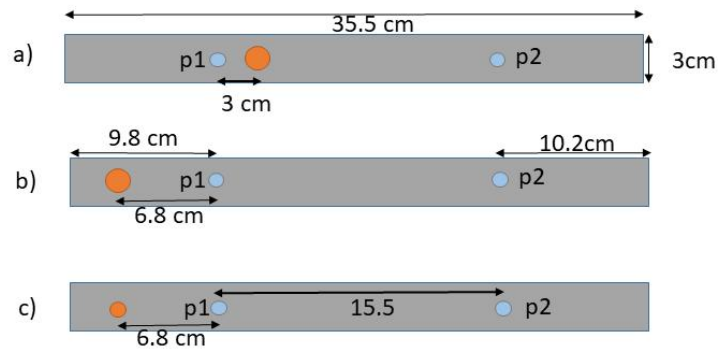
Diagram of p1 and p2 with different damage conditions in the steel beam structure.
